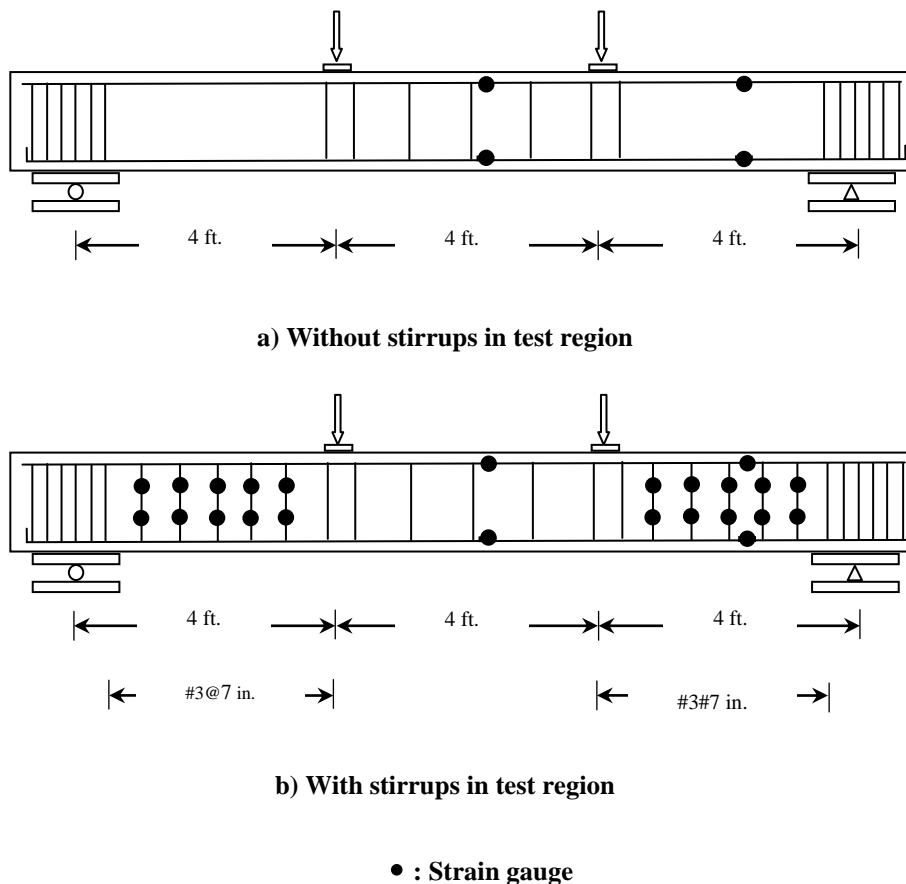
Load Pattern and Location of Strain Gauges on the Test Beams
